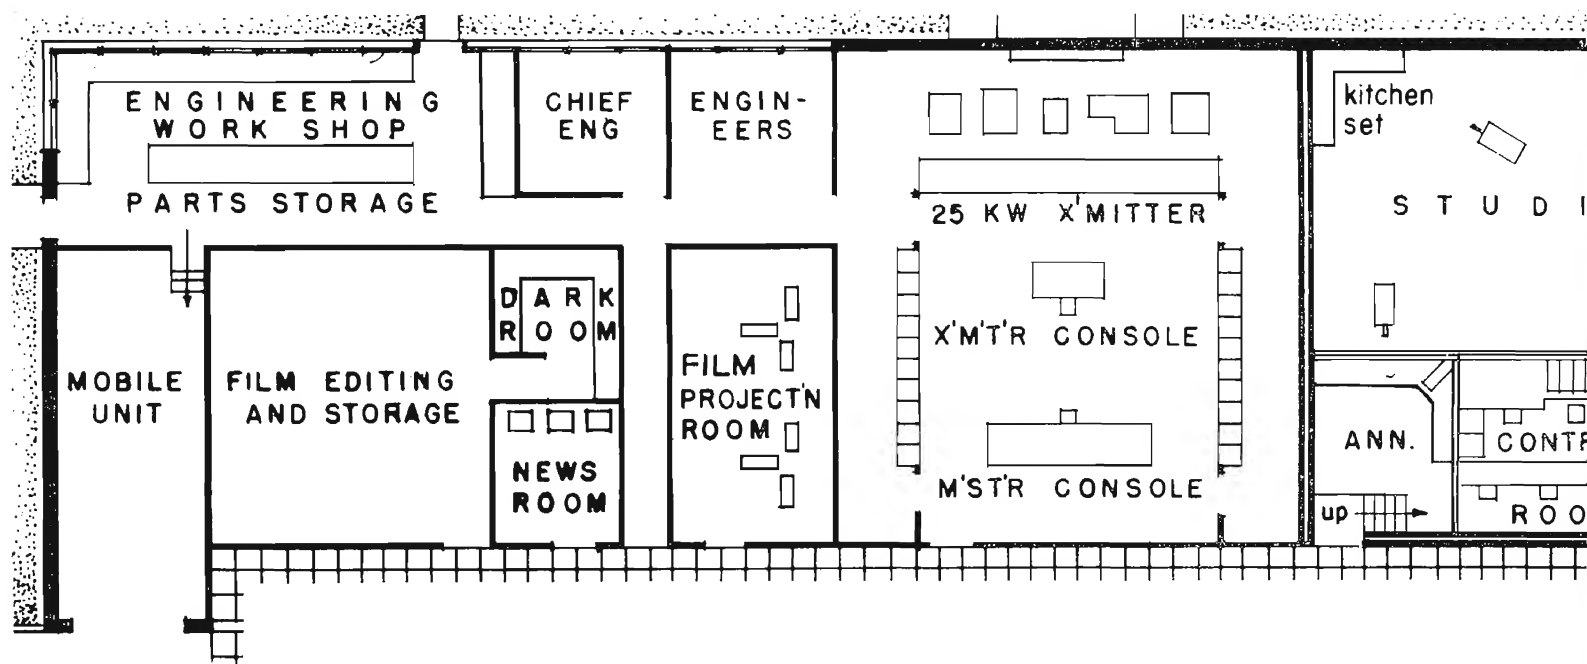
Floor plan layout showing the technical facilities for the Plan "C" Station.
